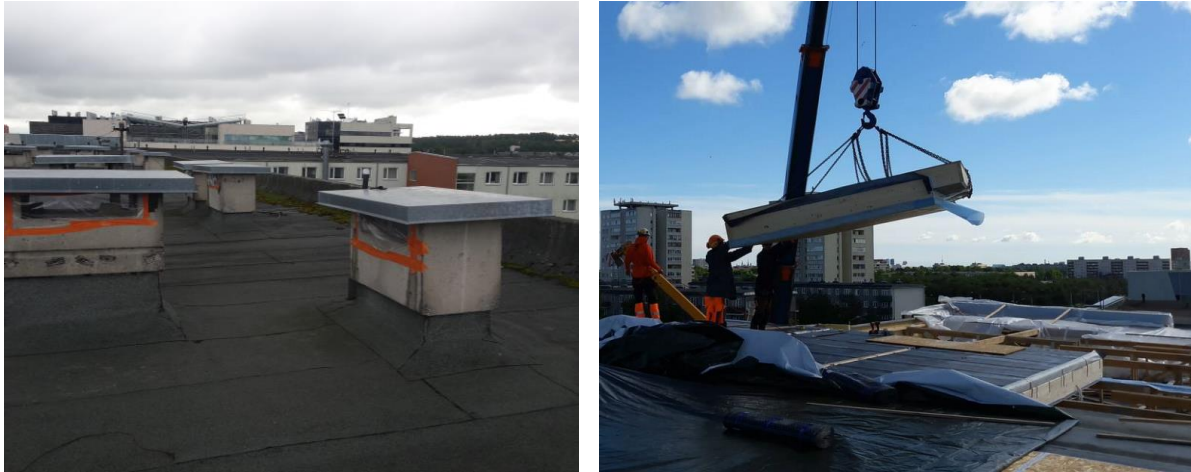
Roof constructions before (left) and during the renovation (right) of the pilot building
